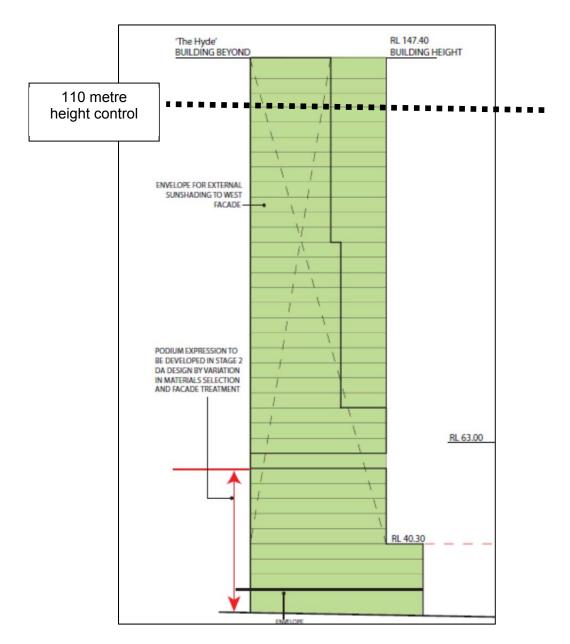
View of the western elevation of proposed building envelope illustrating the extent of technical breach to the building height development standard
